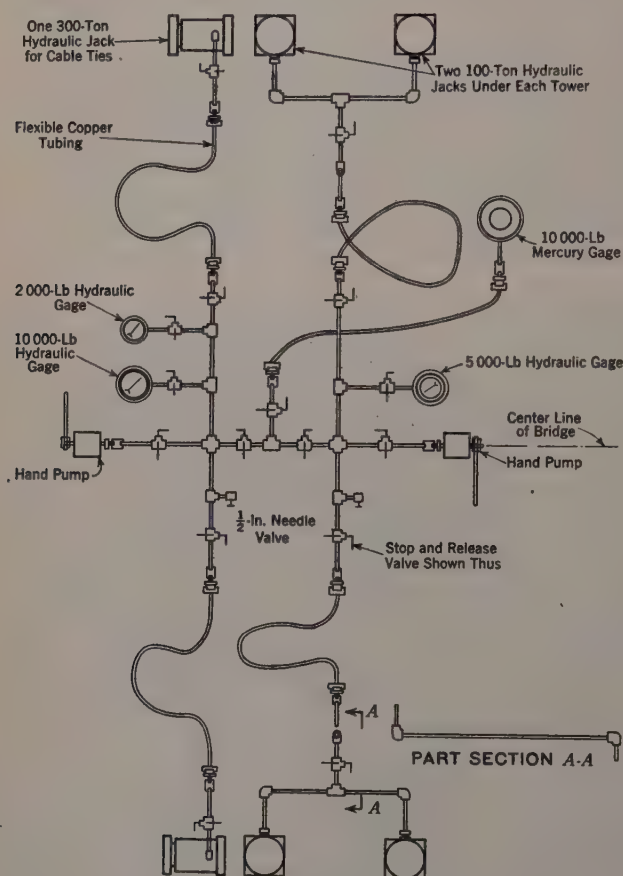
LAYOUT OF HYDRAULIC JACKING SYSTEM
